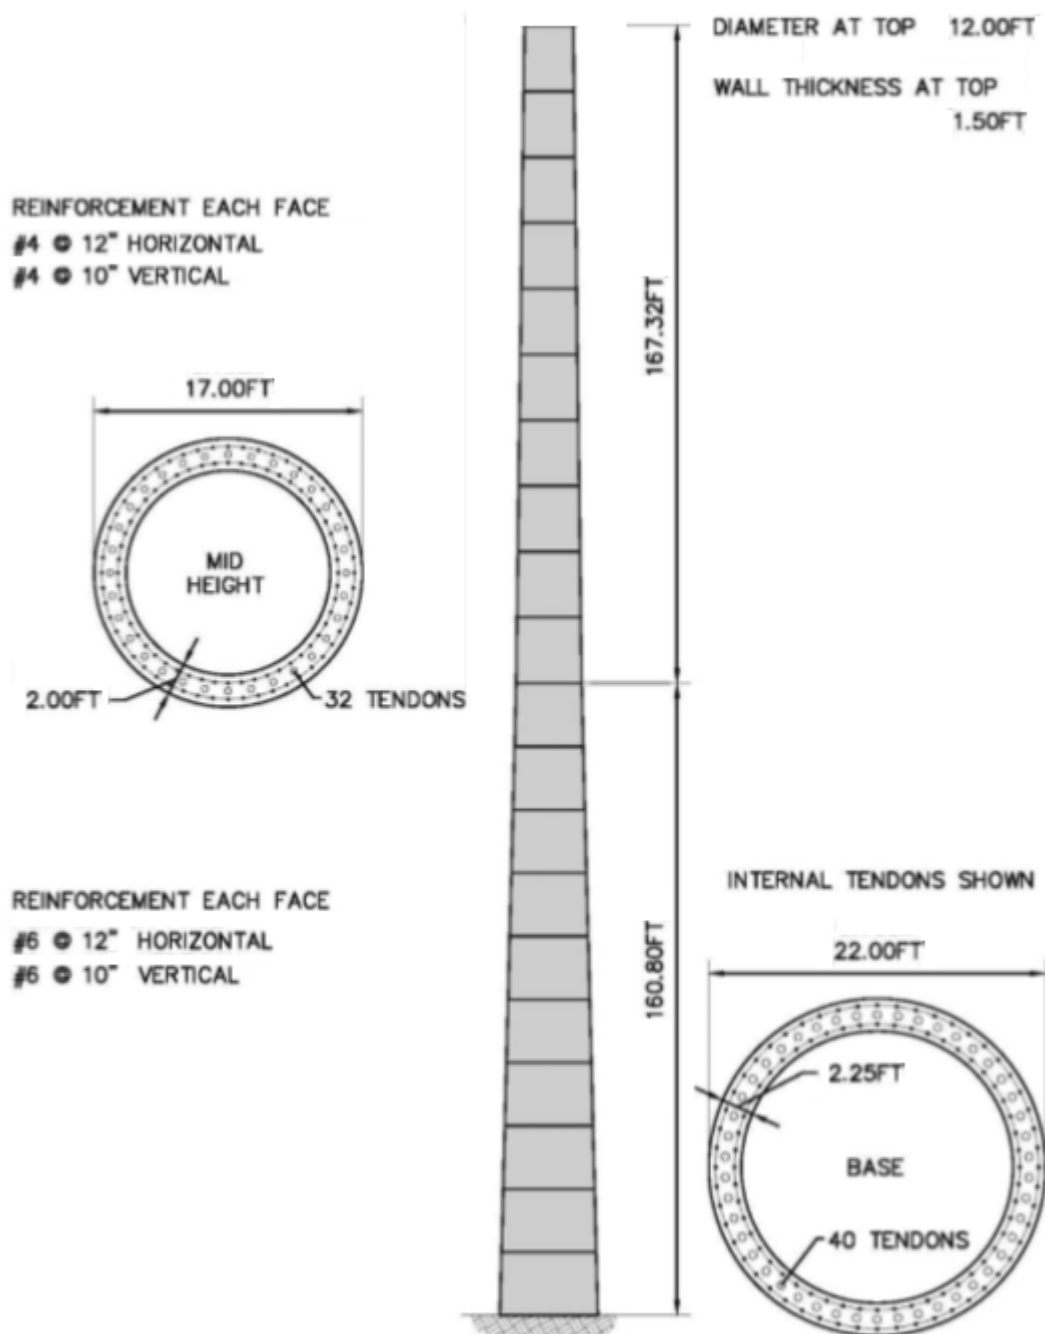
The 320ft concrete circular tower's design plan. (LaNier, M.W., 2005)
